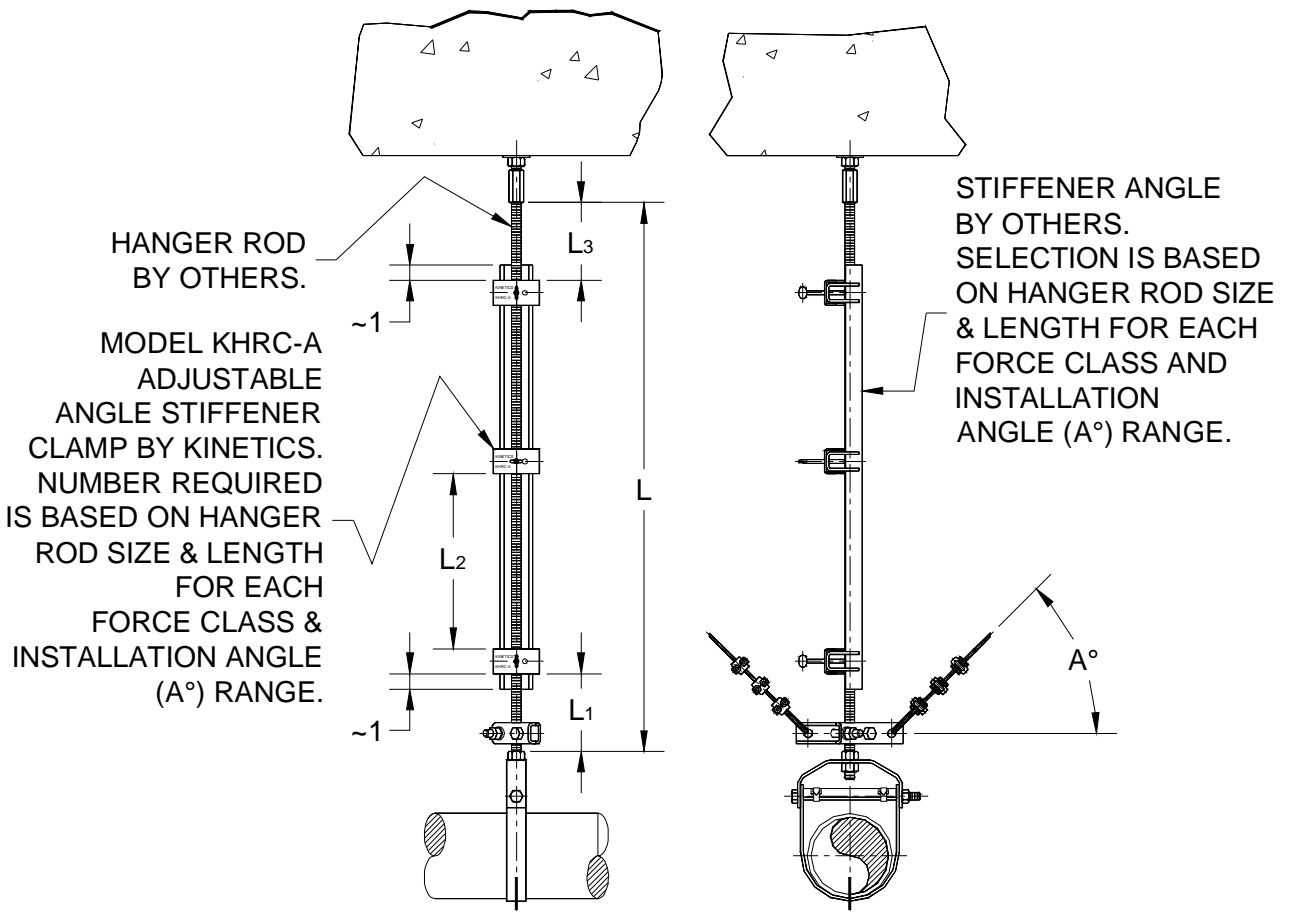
; Typical Hanger Rod Stiffener Installation.
